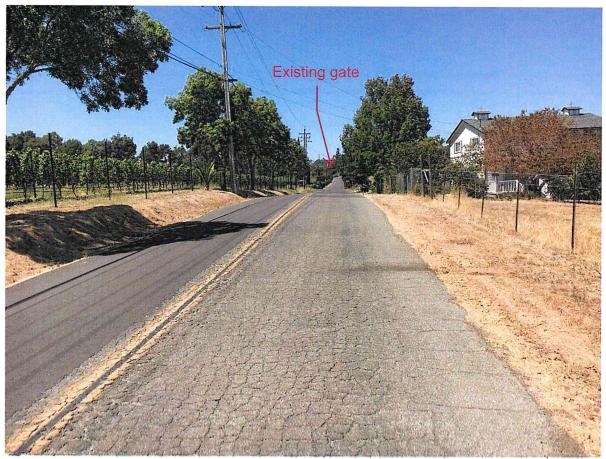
taken from approximately 400 feet away from the existing gate on Second Avenue looking north towards the existing gate.
